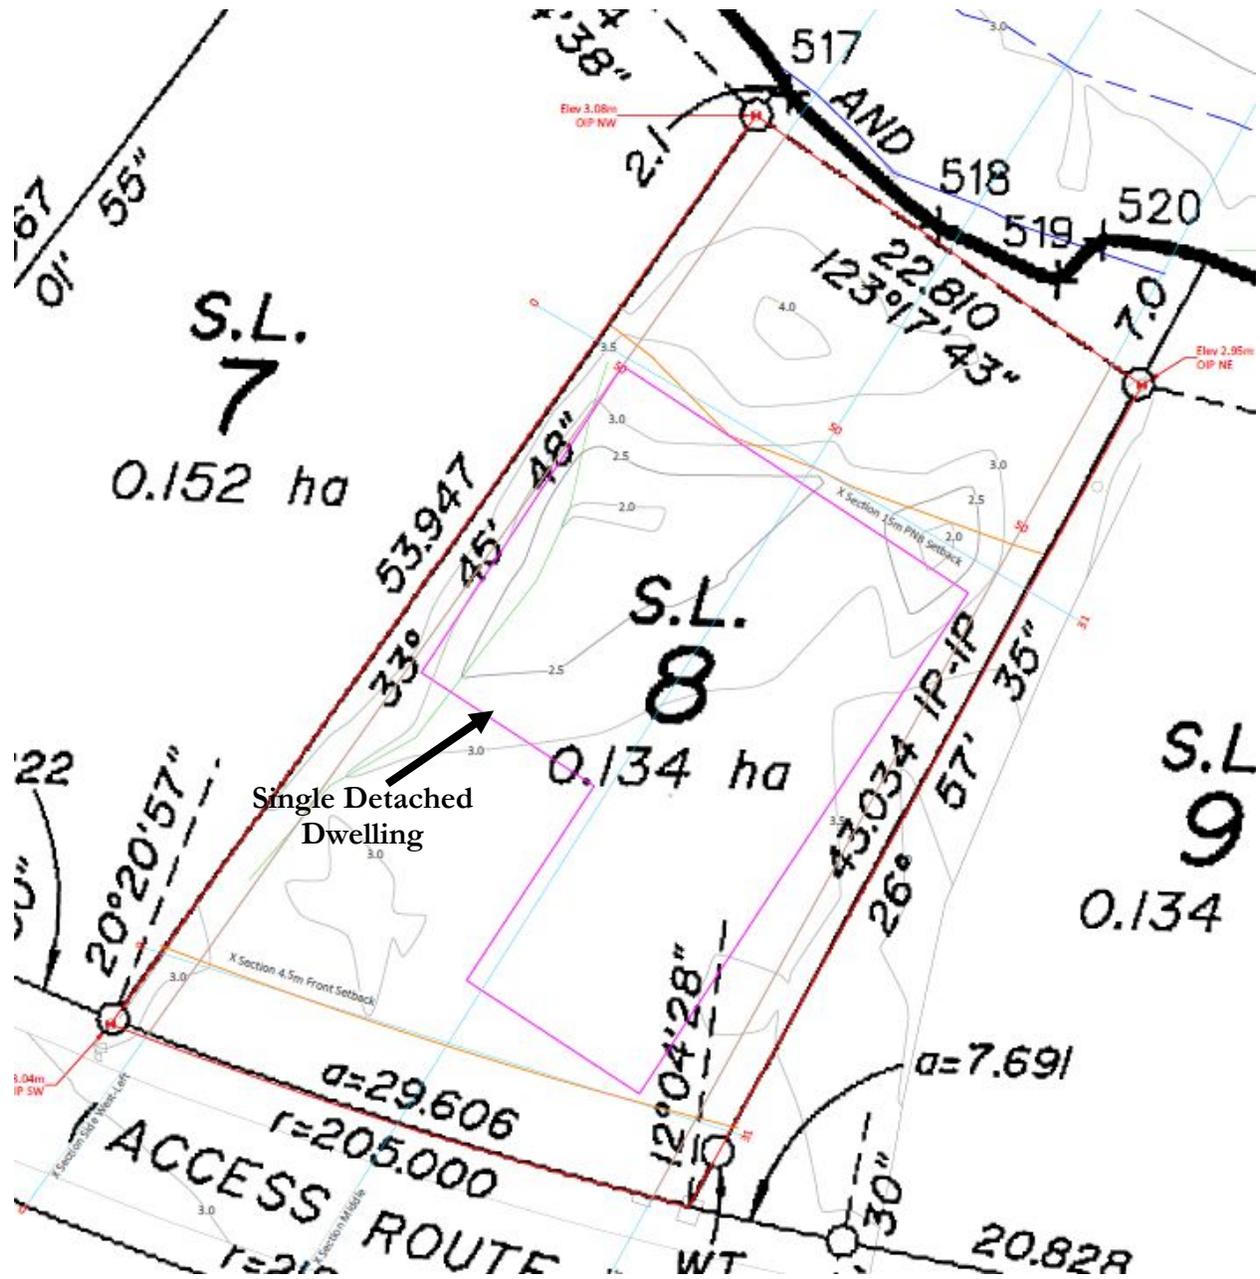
Site Plan of Building Envelope of the Proposed Single Detached Dwelling
